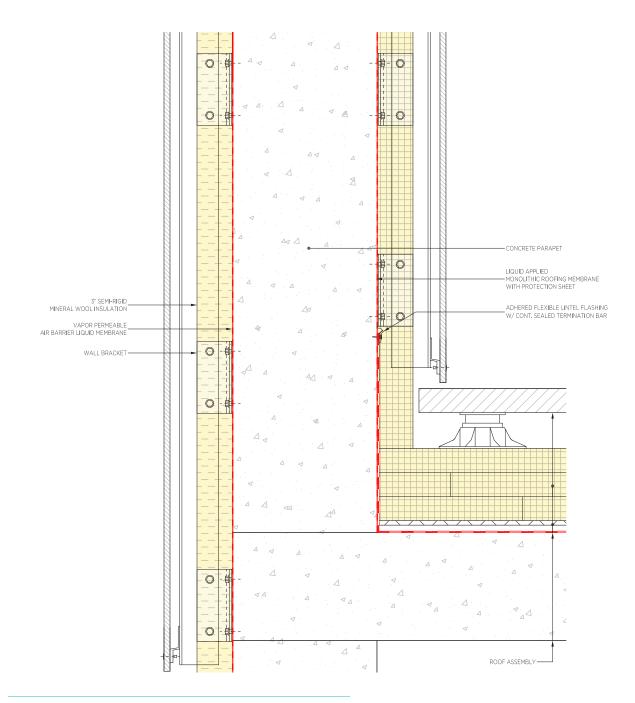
Base case Building -Lightweight rain screen at roof parapet
